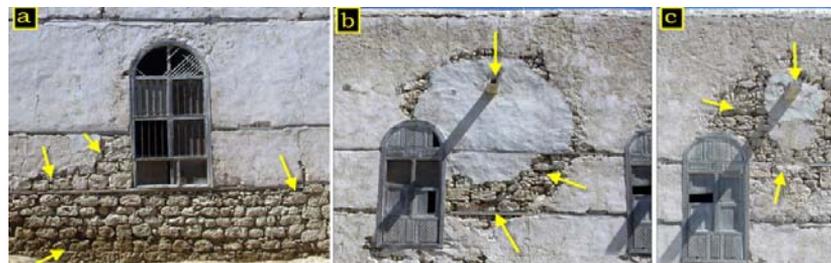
Loss of wall plaster layer from ground level up to 2 m high (a) and deterioration of the wall plaster layer (b,c)
